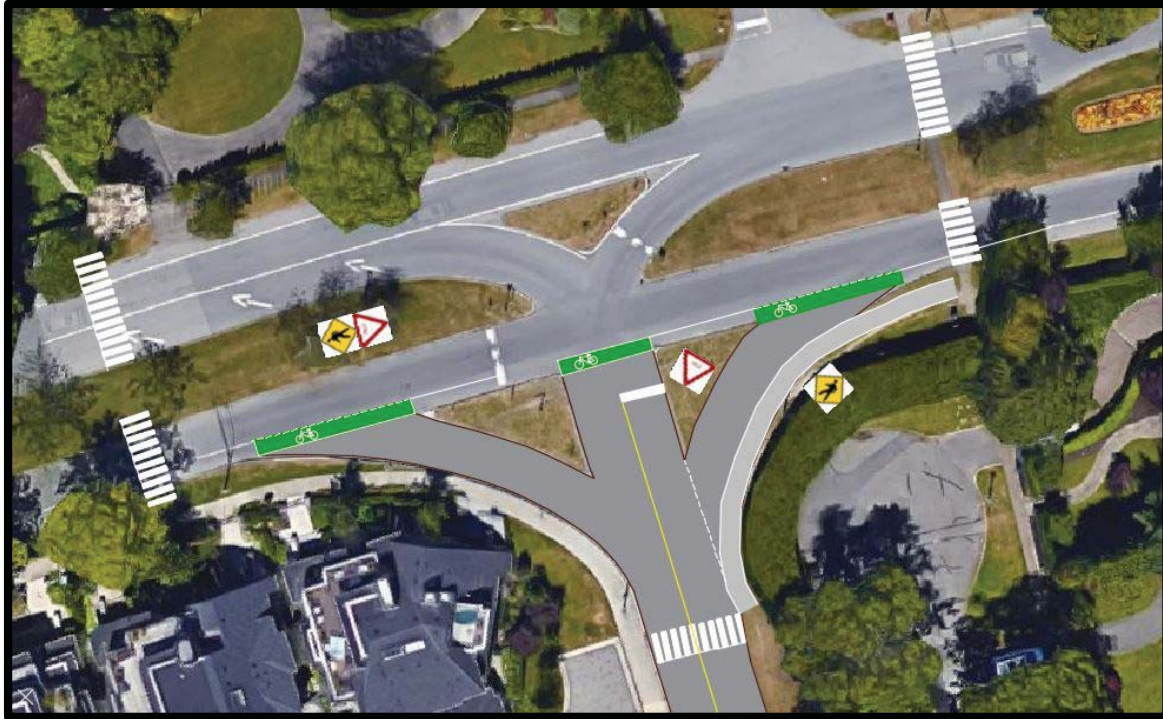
Proposed Upgrades to Existing Intersection: AutoCAD Layover
